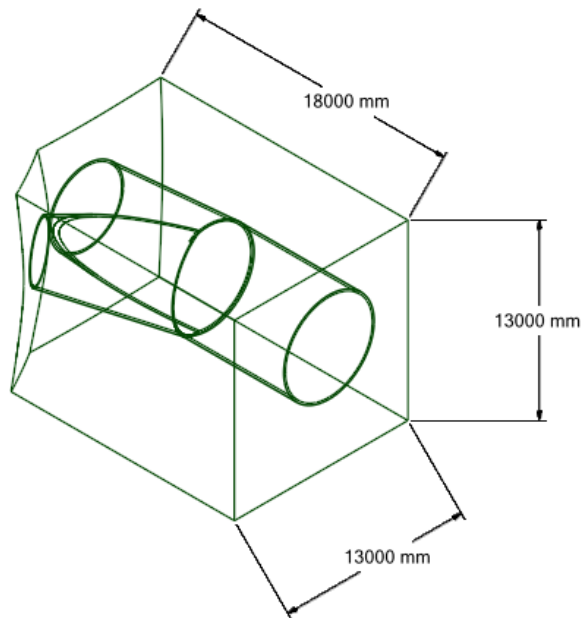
Dimensions of concrete block covering first bifurcation without reinforcement
